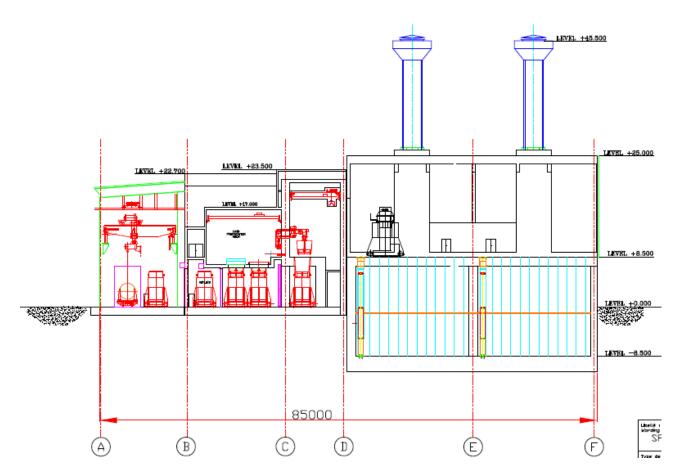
VAULT STORAGE BUILDING - SIDE ELEVATION
